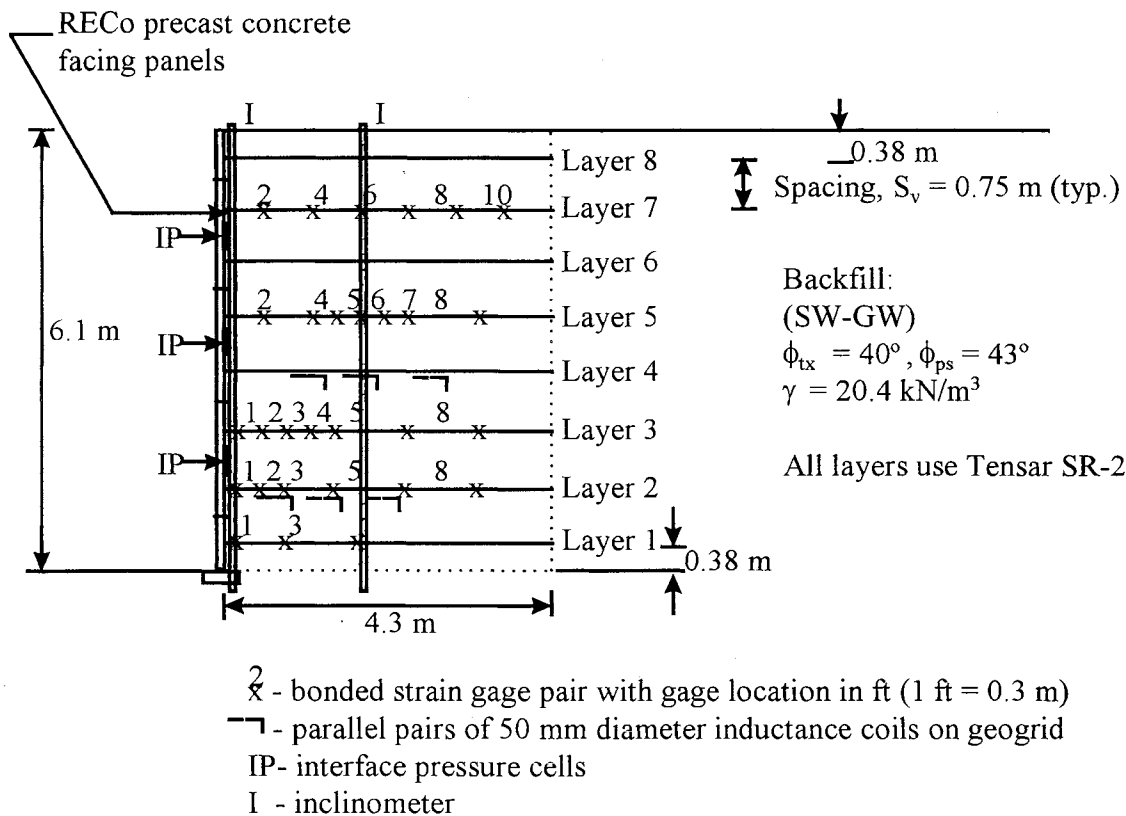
Wall geometry and instrumentation plan for Wall 2 (after Christopher, 1993).
